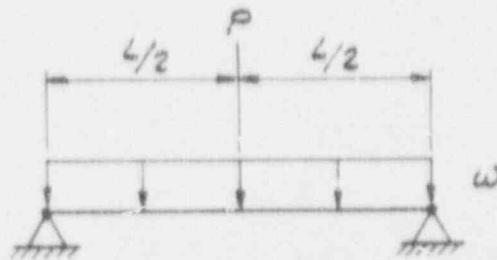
SIMPLE SPAN BEAM ON RIGID
